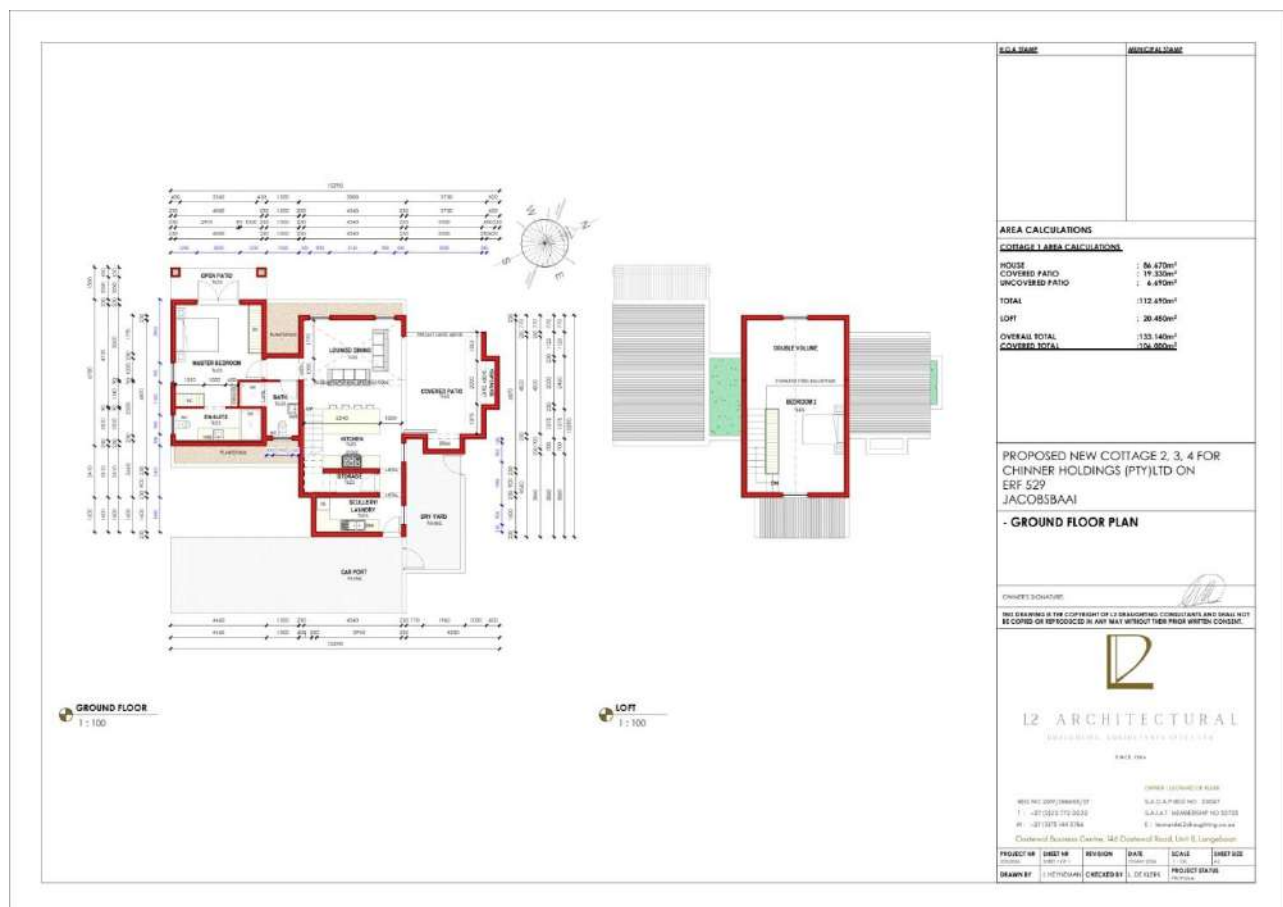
Additional Dwelling Units (Cottages 1 & 2: Floor Plans)
